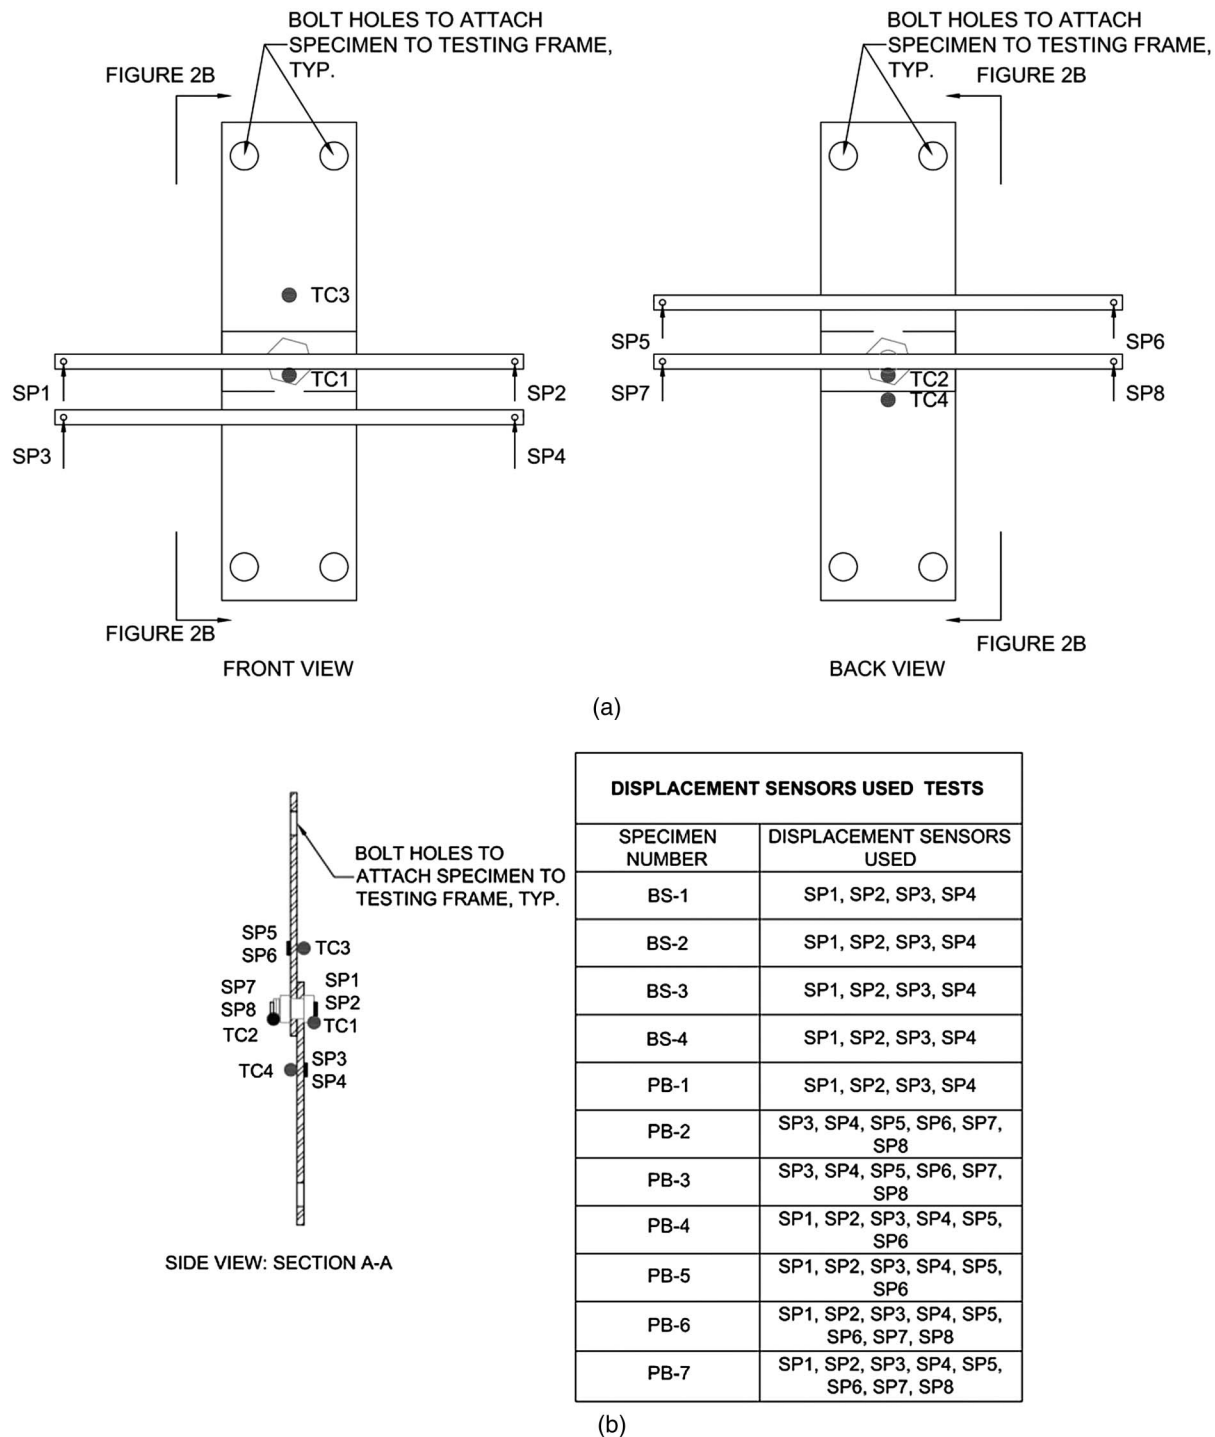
Instrumentation layout for lap-splice joint tests: both bolt shear and plate bearing: (a) elevation view of instrumentation; (b) profile view of instrumentation layout and string potentiometers used in each experiment
